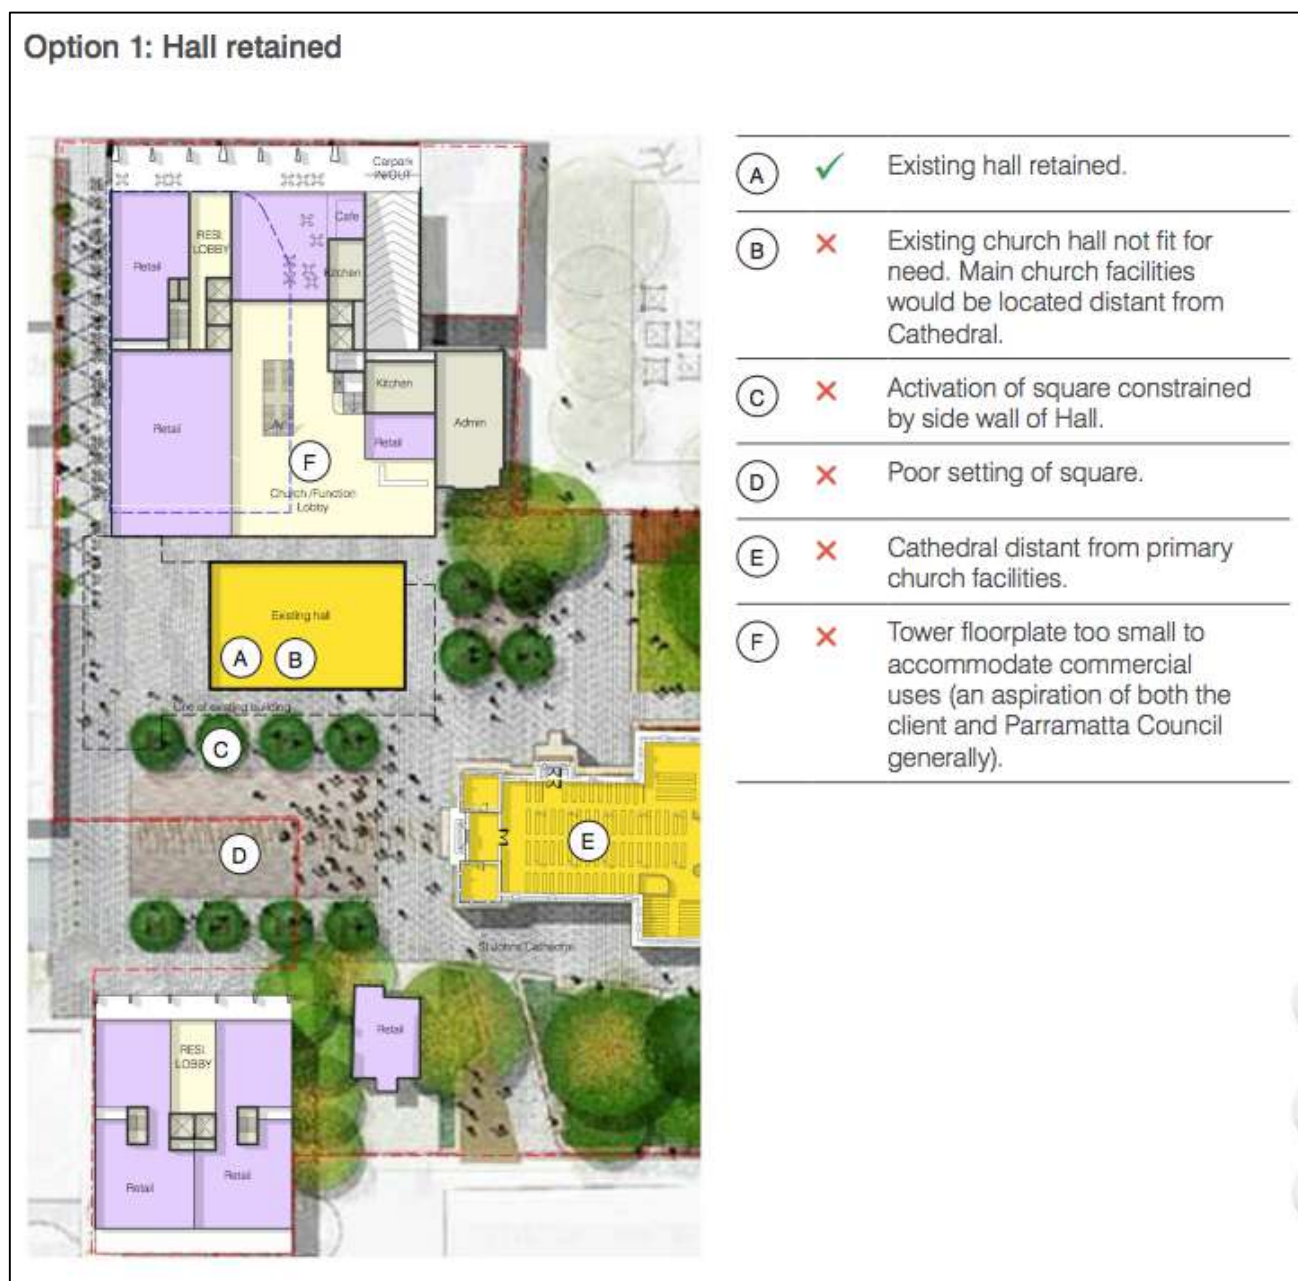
OPTION 1: HALL RETAINED— PROPOSED GROUND FLOOR PLAN (SOURCE: ARCHITECTUS 2018)
